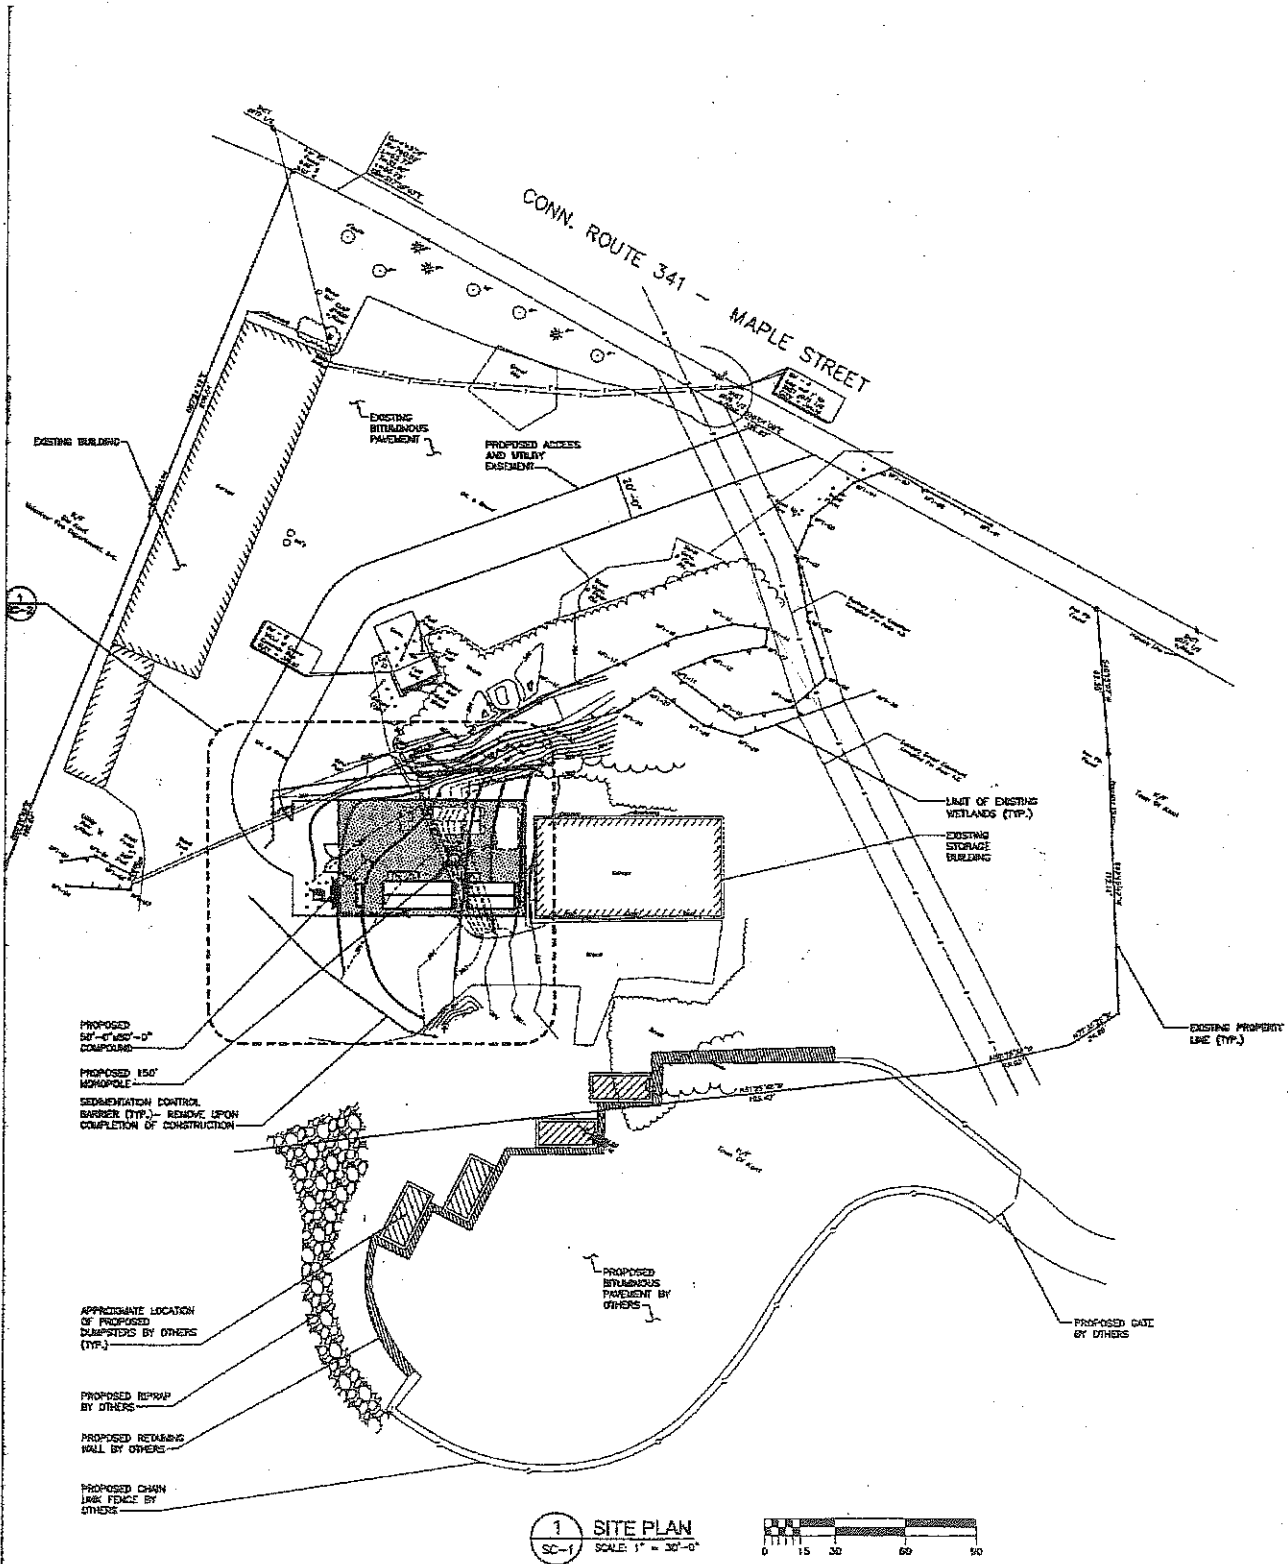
Site plan for the proposed site on the Town of Kent property. (Cellco 1, Tab 1)
